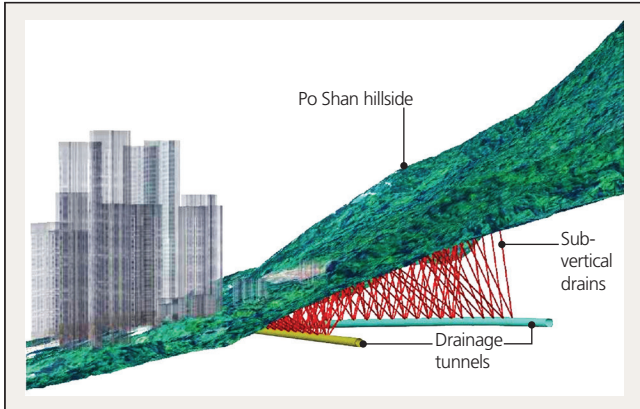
Construction of drainage tunnels at Po Shan natural hillside, Hong Kong
